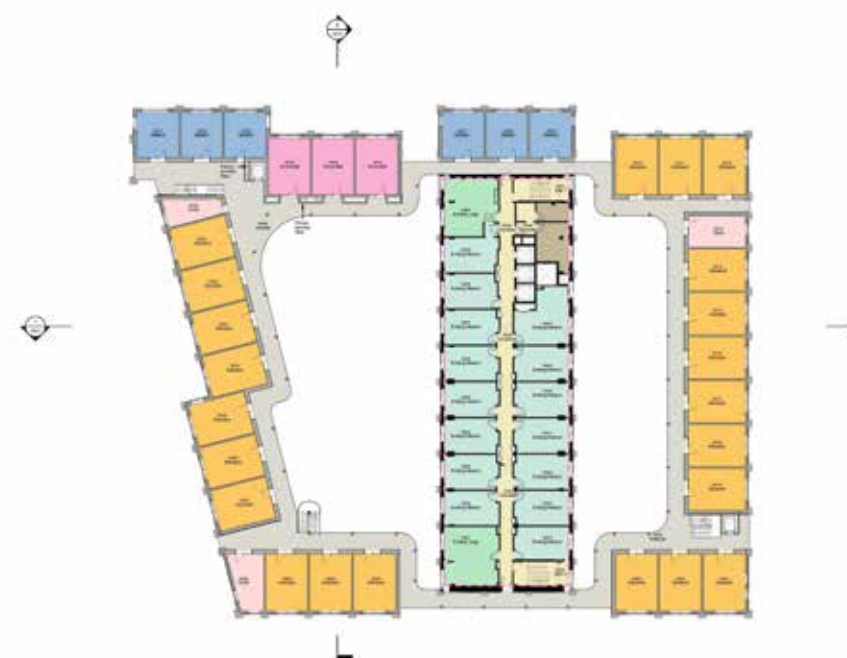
Proposed fifth floor plan, not to scale. (Source: Haptic)
